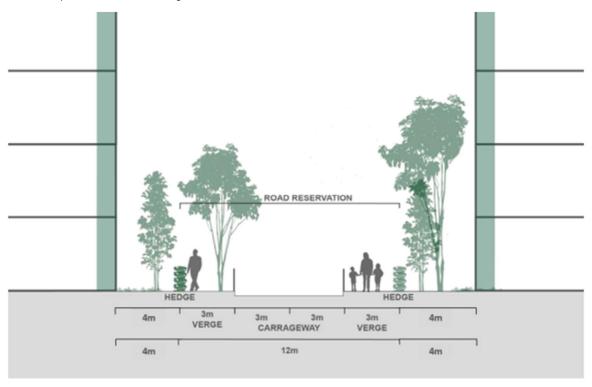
Typical section of new DCP Road adopted in the LCDCP
